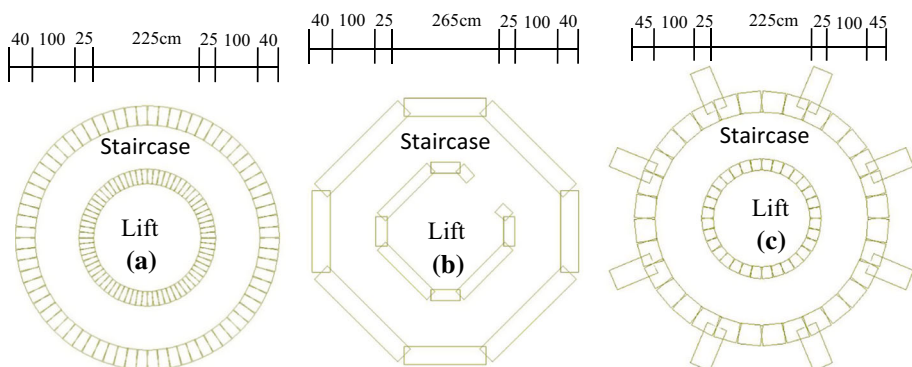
Cross sections of the ATC towers. a Tower 1, b Tower 2, c Tower 3
